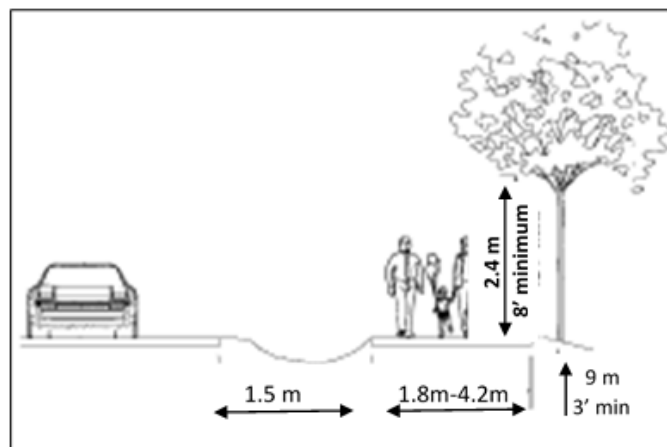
Pedestrian facilities showing side walk including curb, crossing, street lighting and street furniture.
